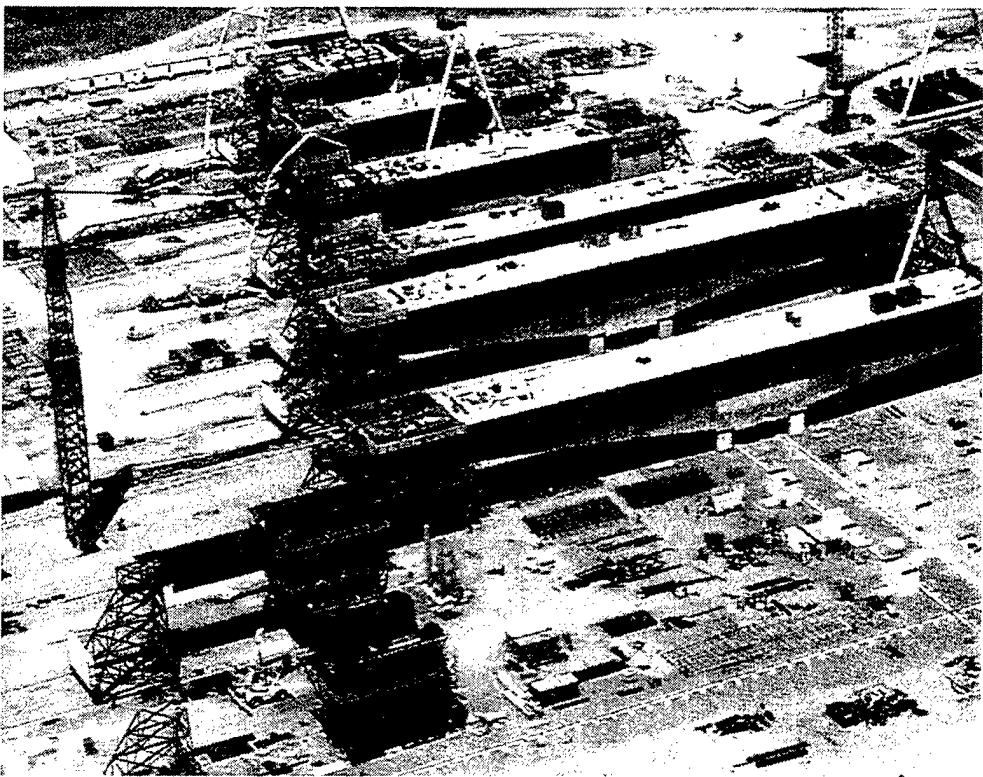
(a) Cantilever Construction of the Main Girders on Pillars
